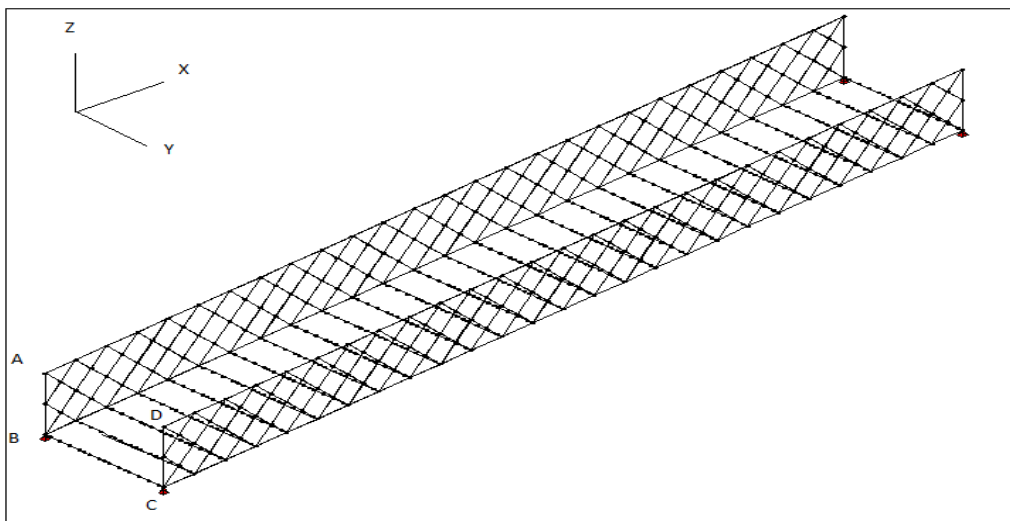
Diagram of Kalbaskraal bridge used for fieldwork planning
